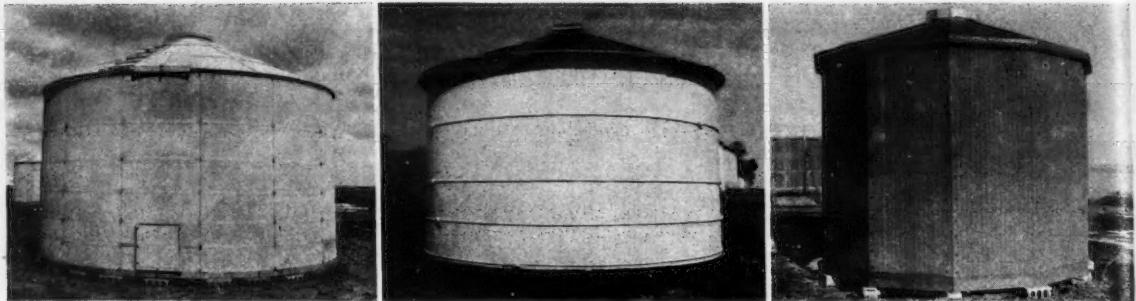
(Left) A grain bin with walls and roof of $\frac{3}{8}$ -in insulation board. Wall panels are 4 ft wide and 10 ft high and consist of two thicknesses of board with a $\frac{1}{2}$ -in air space between. Roof is made of several sections with two laminations. Floor is of wood laid on 4x4-in joists. Light bands are supplied to take care of the hoop tension. These are bolted at wall panel joints. Diameter, 19 ft; height to eave, 10 ft; capacity, 2250 bu • Fig. 7 (Center) A circular grain bin of matched vertical siding. Steel hoops are supplied to resist the grain pressures. Diameter, 15 ft; height, 10 ft; capacity, 1700 bu • Fig. 8 (Right) A 12-sided prefabricated bin. Floor, wall, and roof are all in prefabricated sections. The walls consist of matched vertical siding over 1-in sheathing. Diameter, 14 ft; height, 10 ft; capacity, 1300 bu
